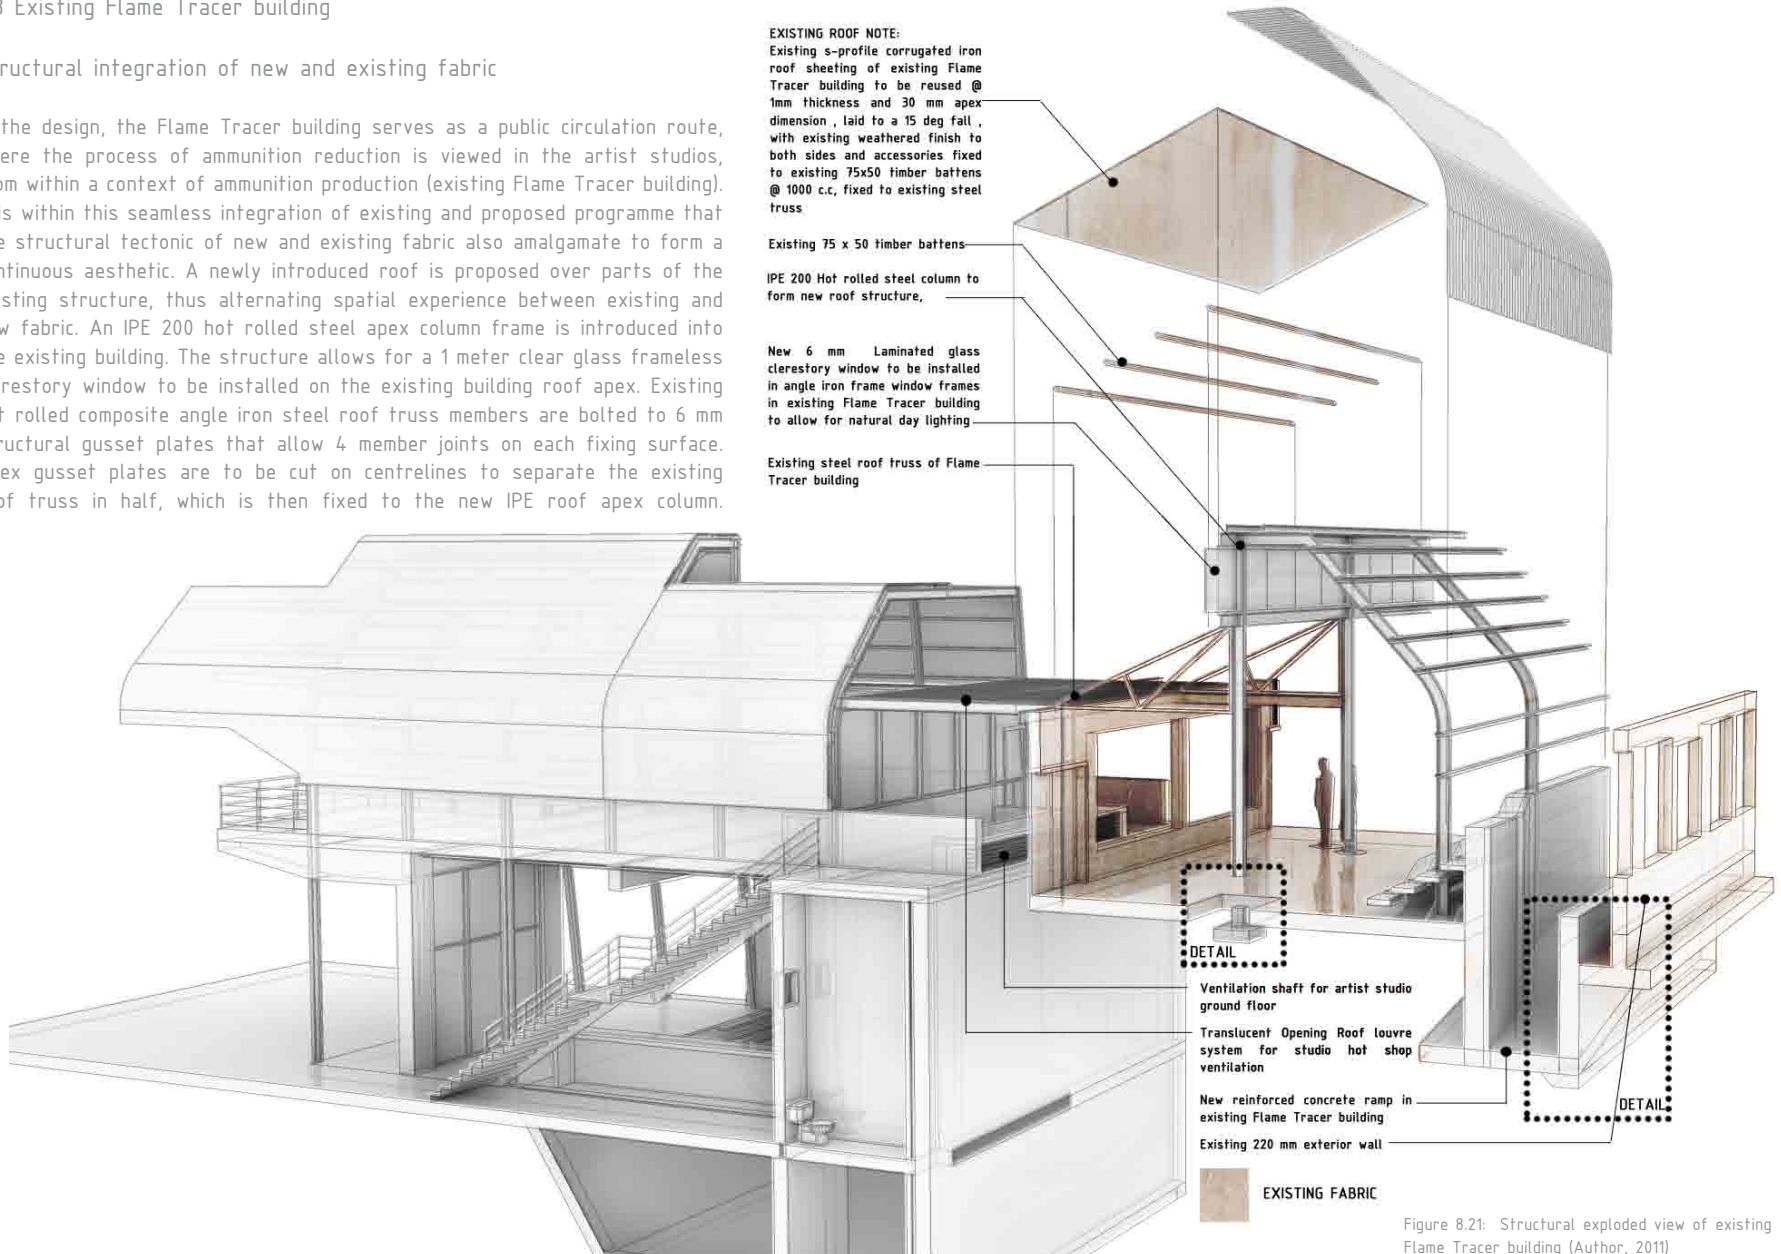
Structural exploded view of existing Flame Tracer building (Author, 2011)
